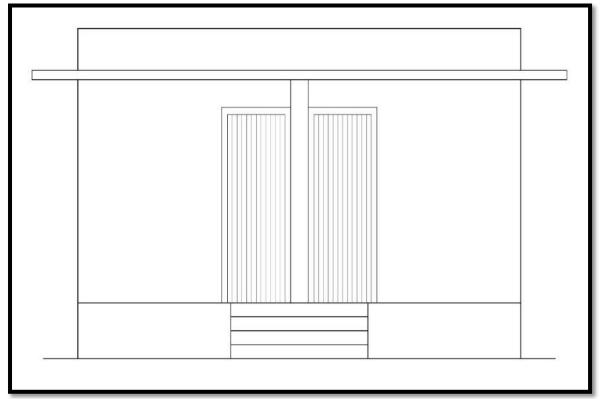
PLAN OF PRIMARY SCHOOL TOILET
